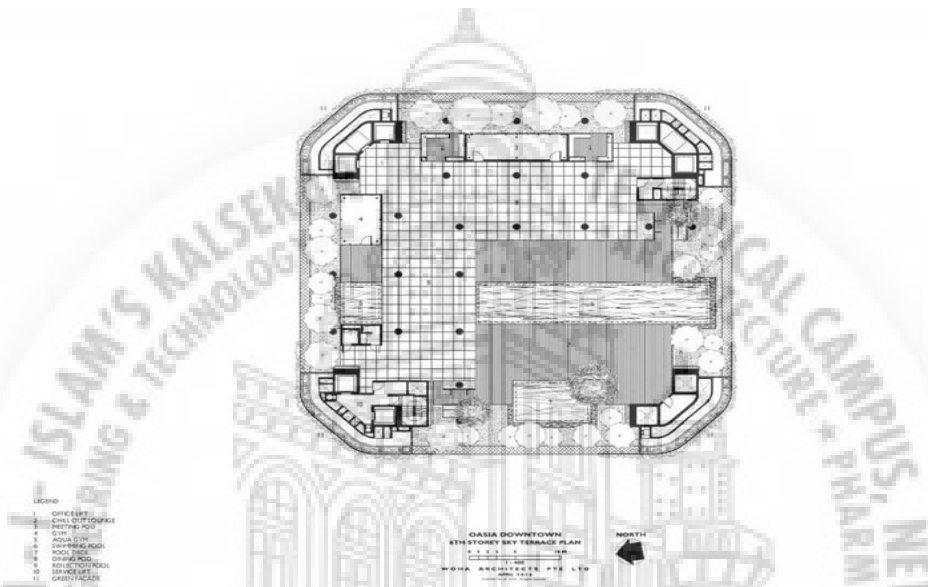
Oasia Hotel Downtown plan (Source – Arcdaily)
